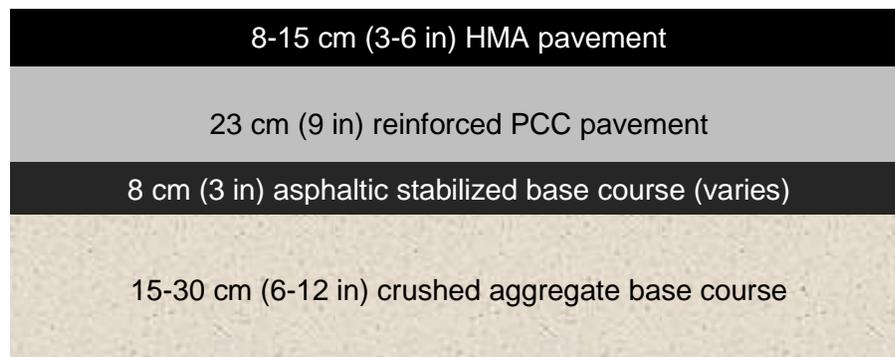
Schematic of existing pavement structure, not to scale (Strand Associates, 2014)
